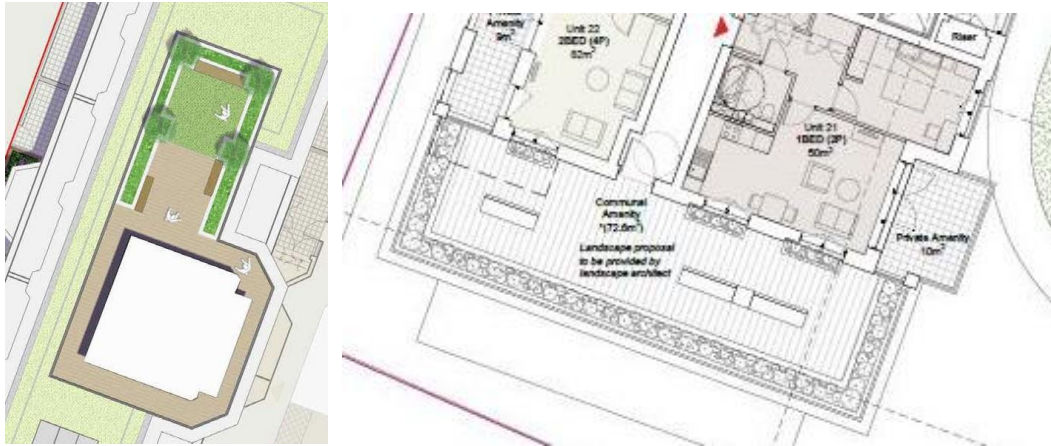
Orsett Street roof top amenity, Jonathan Street 5th floor amenity
